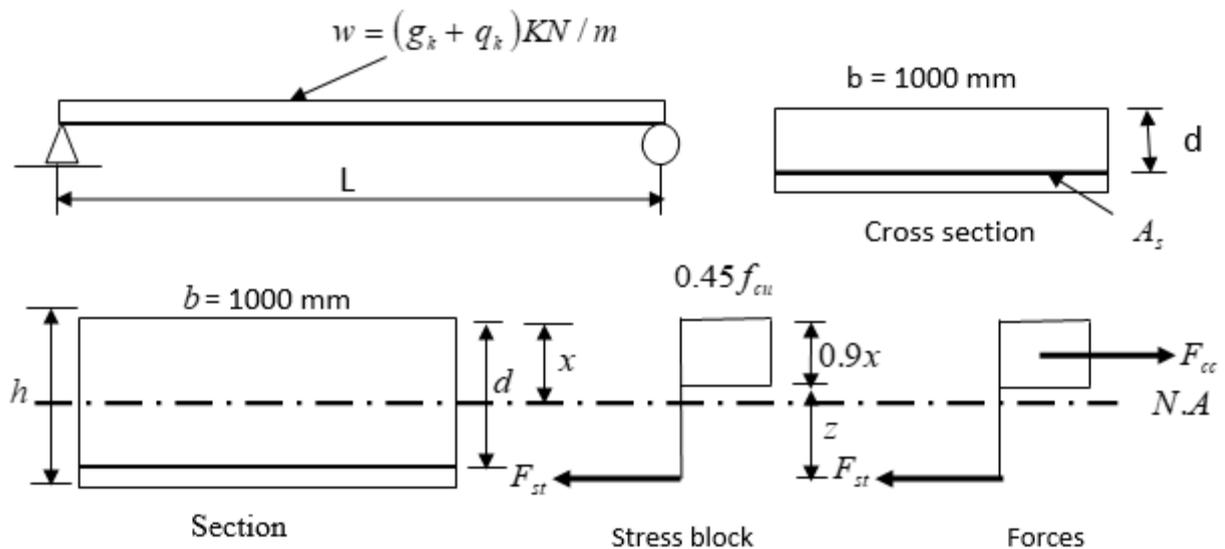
A continuous one way reinforced concrete slab under uniform loading and assumed stress block
